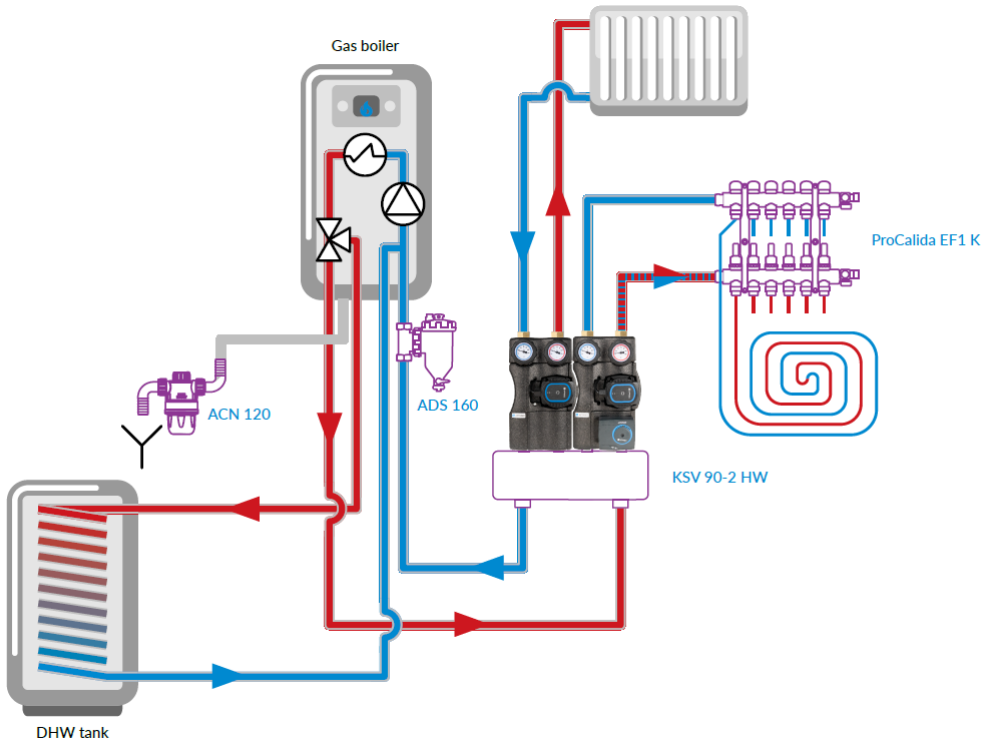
BPG assemblies mounted on a KSV 90-2 HW boiler manifold with integrated hydraulic separator in a mixed system with a gas boiler
